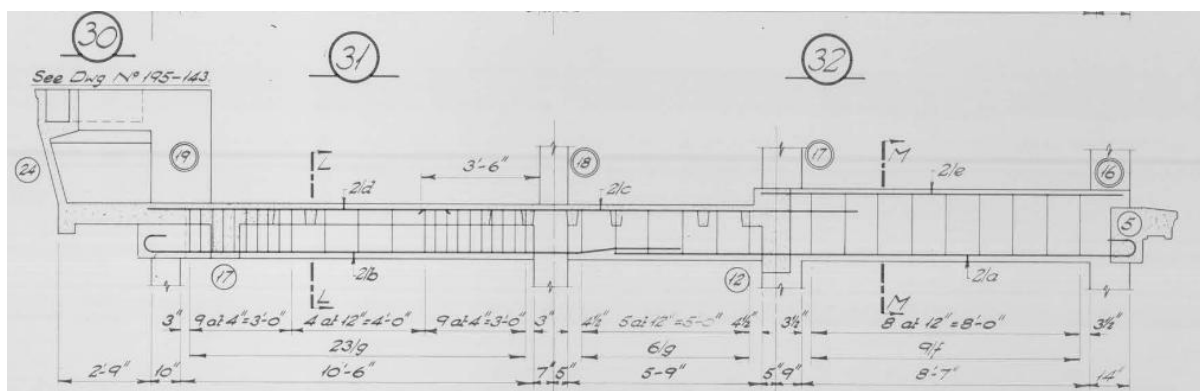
Section Through Beams From Front to Rear Elevation Noting Continuous Reinforcement and Anchorage Lengths of Main Reinforcement Through Columns.
